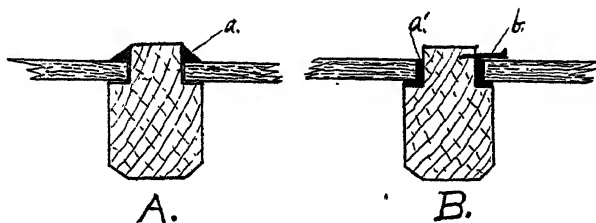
A, window glazing; B, greenhouse glazing. The putty is shown at a and b.
